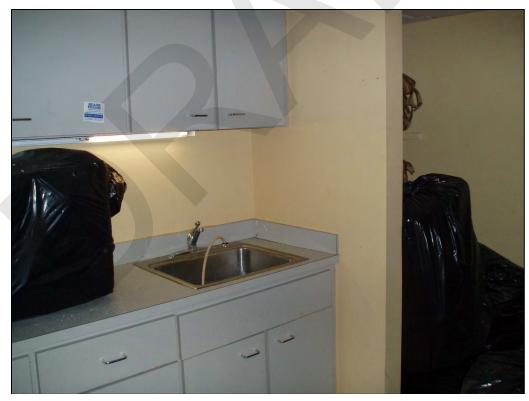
Floor 1-Ground, Room 13 equipment storage (Field Photograph P1010078, 2/10/2020).
